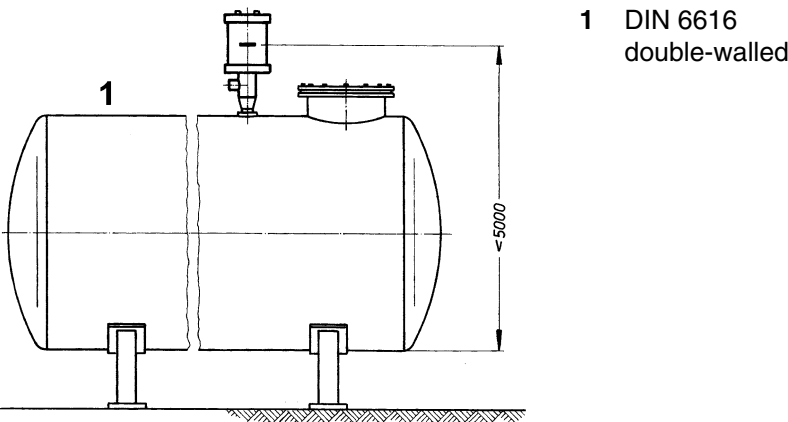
LAS 24 (E), LAS 39 (E), LAS 72 (E) at a horizontal, cylindrical tank according to DIN 6616. LAS 230 installed the same way.
